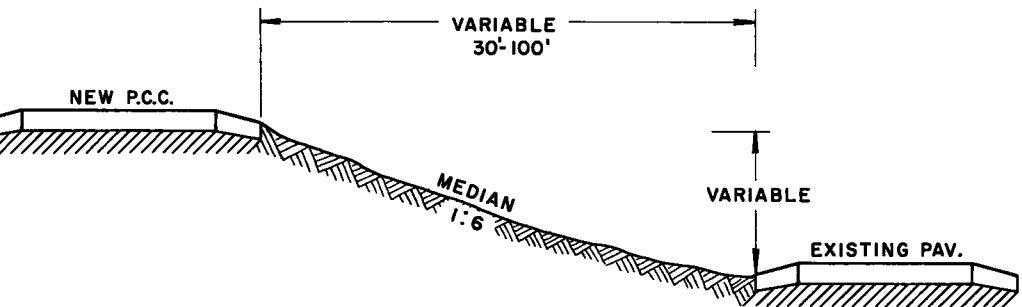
Cross-section—dust control test sections, road V-Mon-2-D.
